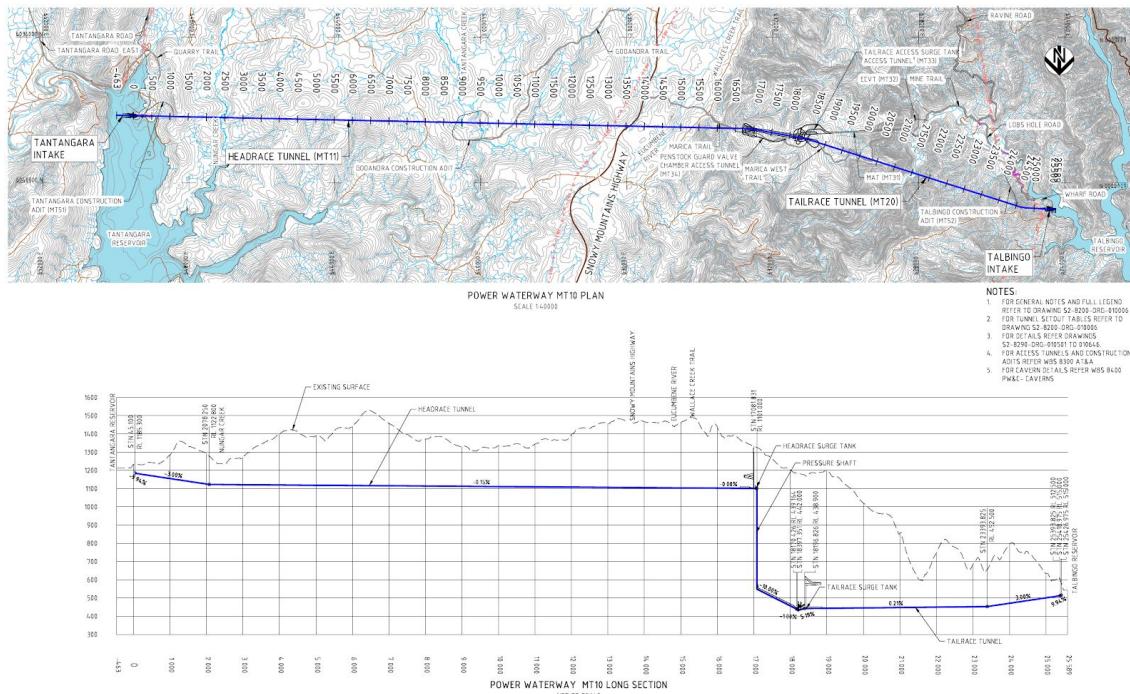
Plan (top) and Long Section (bottom) of the Power Waterway
